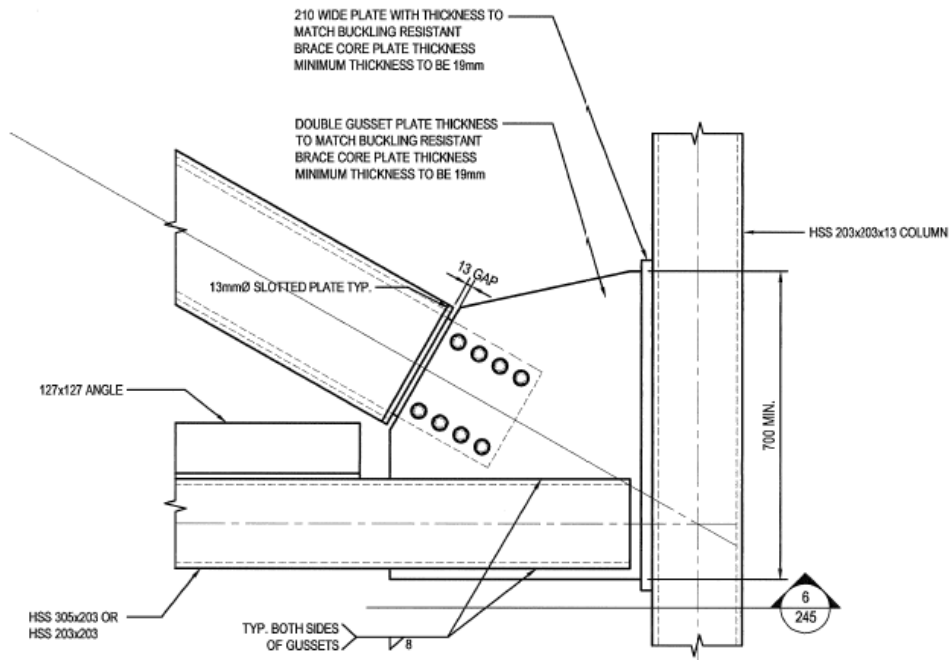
Lower connection detail (Structural tender drawings, 2010)
